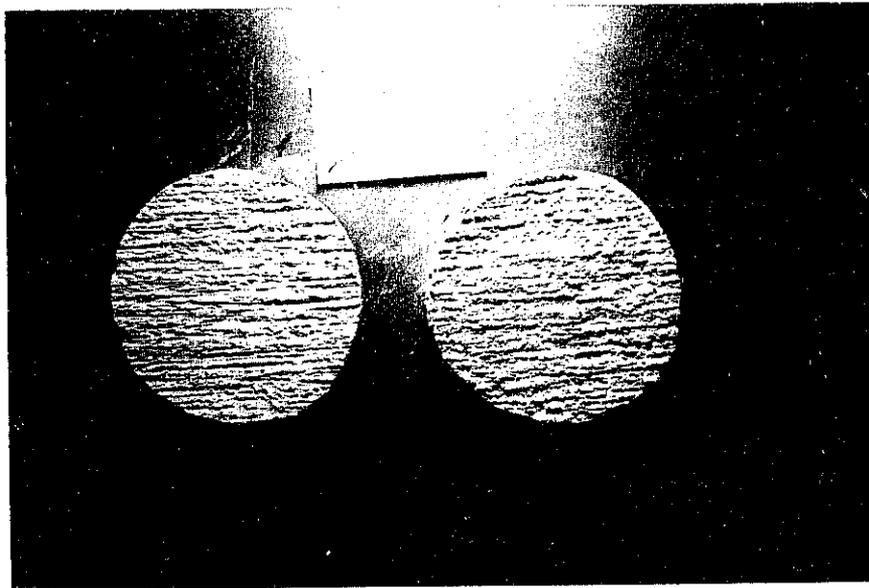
Comparison of plaster of paris casts of the surface of portland cement concrete pavement before testing (left) and after 200 stop applications (right).
